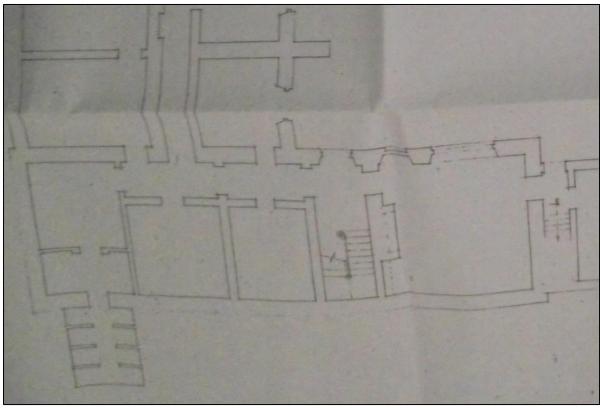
Lower ground floor plan, extract covering the application site, 1974, orientated looking south (Francis F. Johnson & partners)
